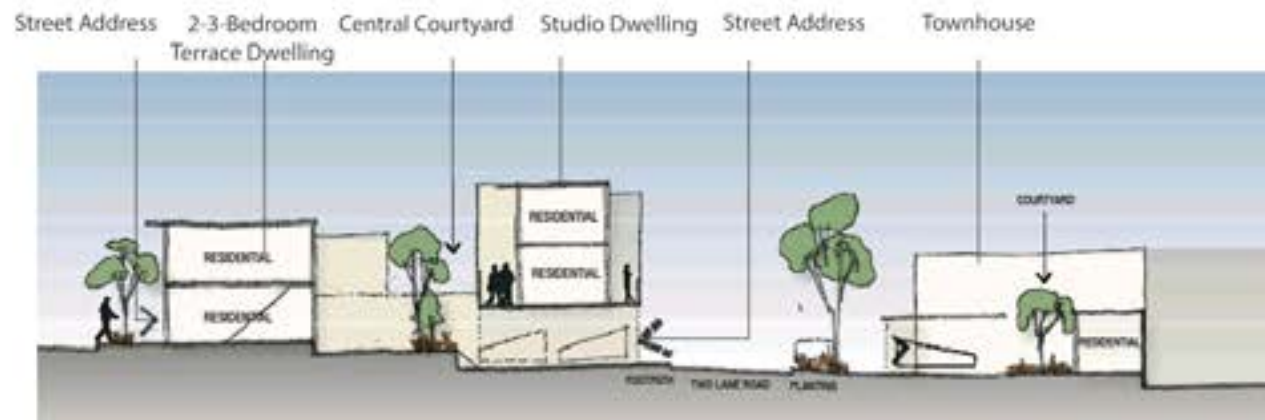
Indicative Townhouse Section (Source: HASSELL, 2008)
